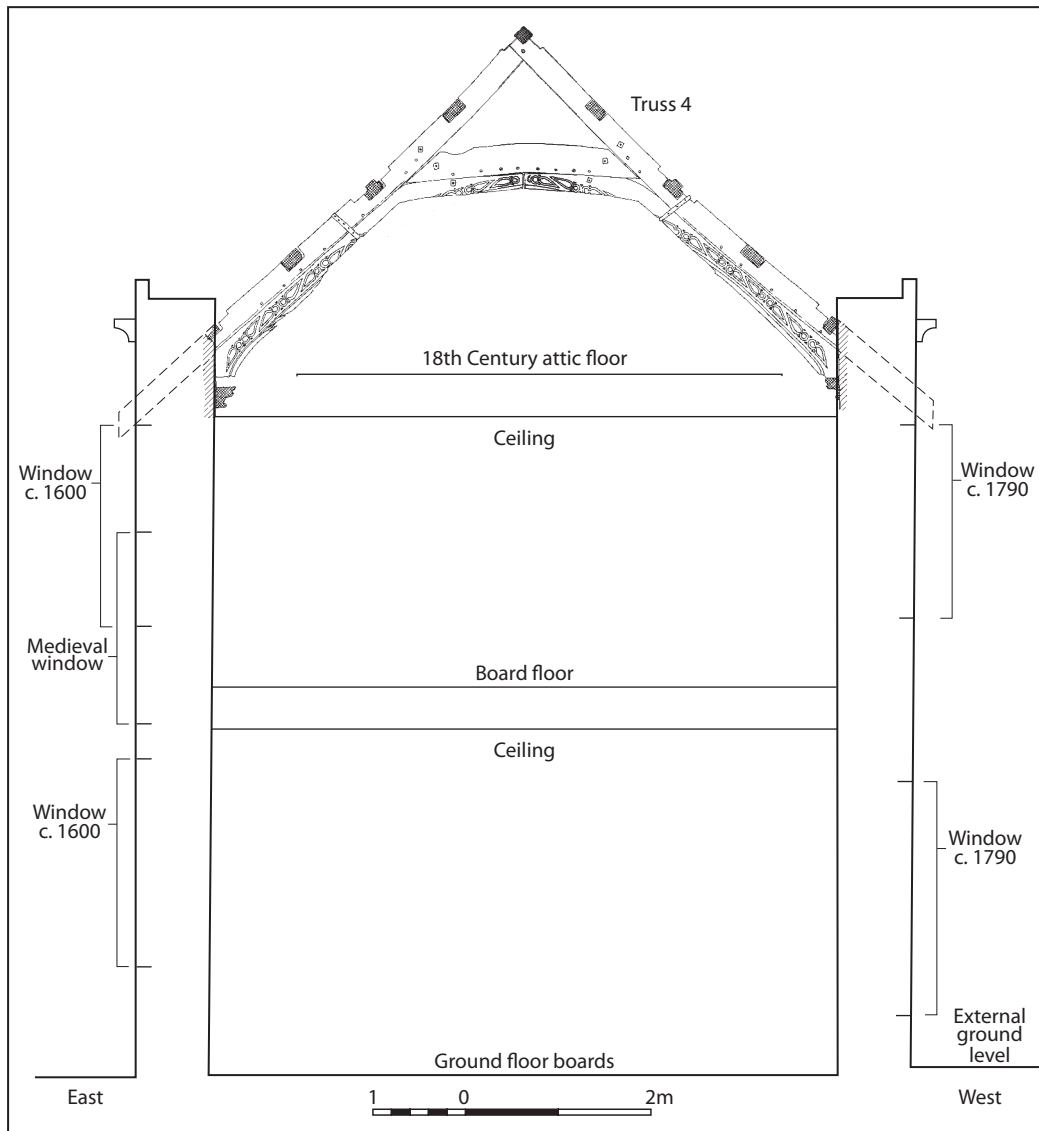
Cross section of the west wing showing the early 16th-century roof timbers in relation to the existing floors
